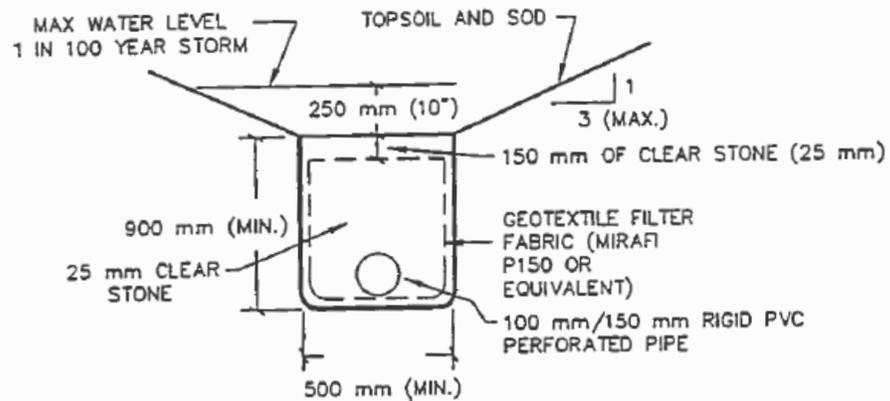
SWALE AND UNDERDRAIN CROSS SECTION
